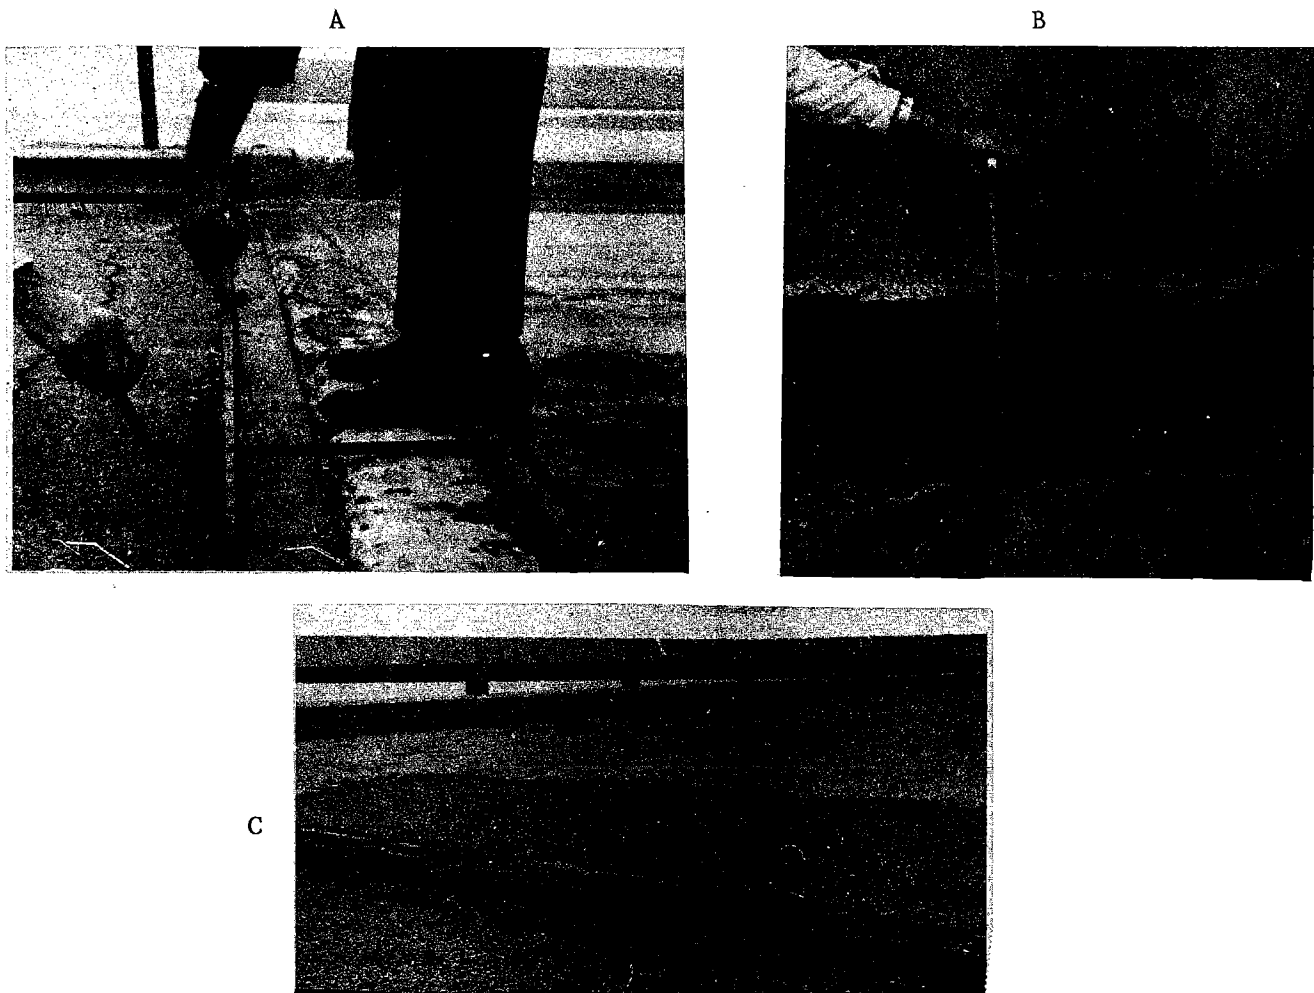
Evidence of settlement. A. Settlement of approach fill at abutment no. 1, about 5 inches. B. Settlement of approach fill at abutment no. 2, about 4 inches. C. Settlement at base of abutment seat, about 18 inches in April 1968. Note exposed piling.
